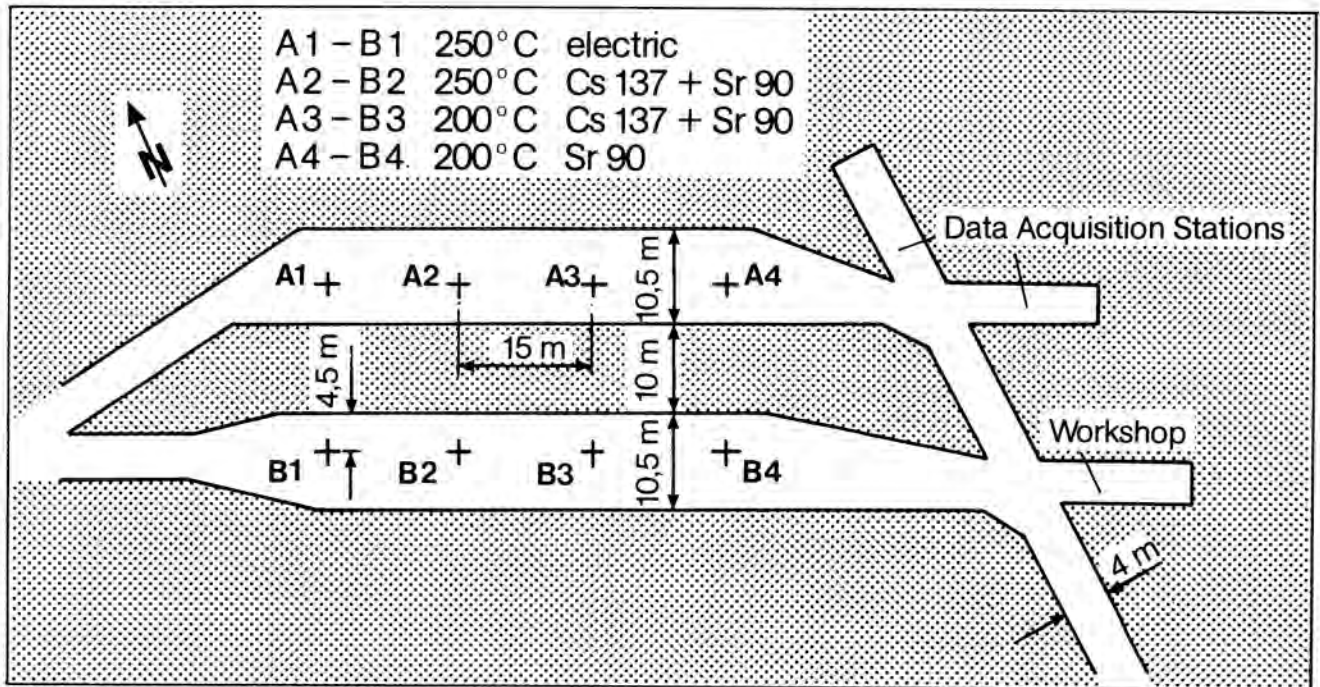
Layout of the HAW Test Field on the 800 m Level and Arrangement of the Emplacement Boreholes.
